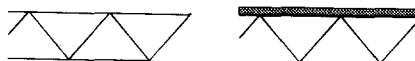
Example layout of a $1\frac{1}{2}$:1 space truss.
